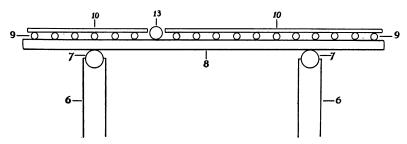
Side View of House Floor. 6, Floor piles; 7, Main floor plates; 8, Longitudinal floor plates; 9, Transverse floor plates; 10, Flooring; 13, Transverse center floor beam.
